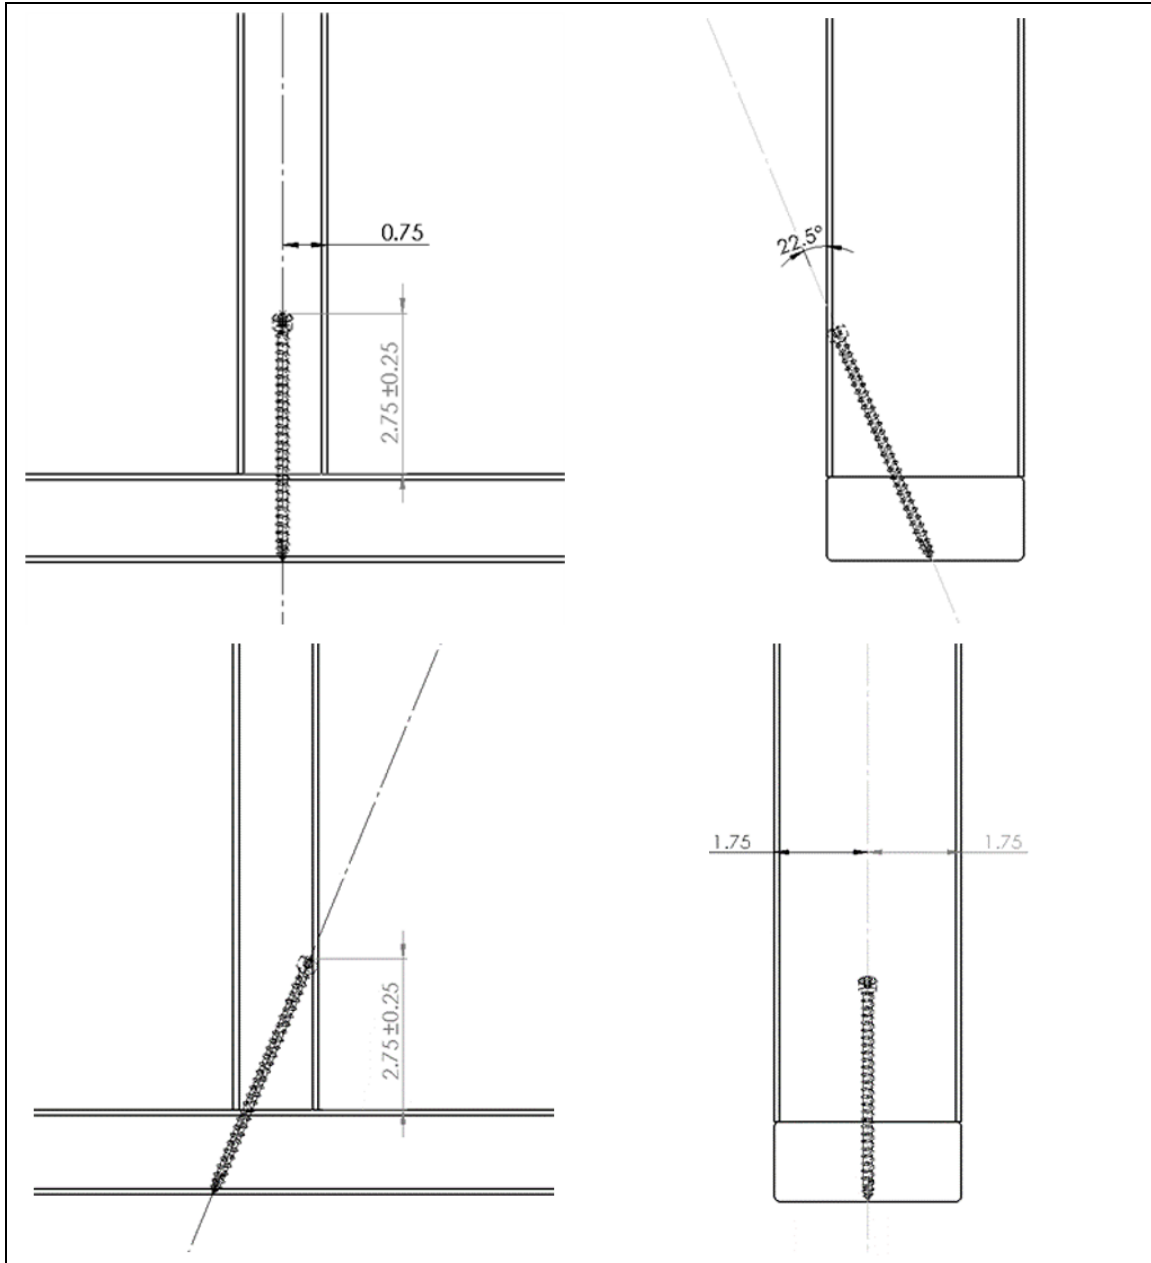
Stud to Bottom Plate – 4°-14° (Angle), Three 6" TRX Truss Screws Install Option
